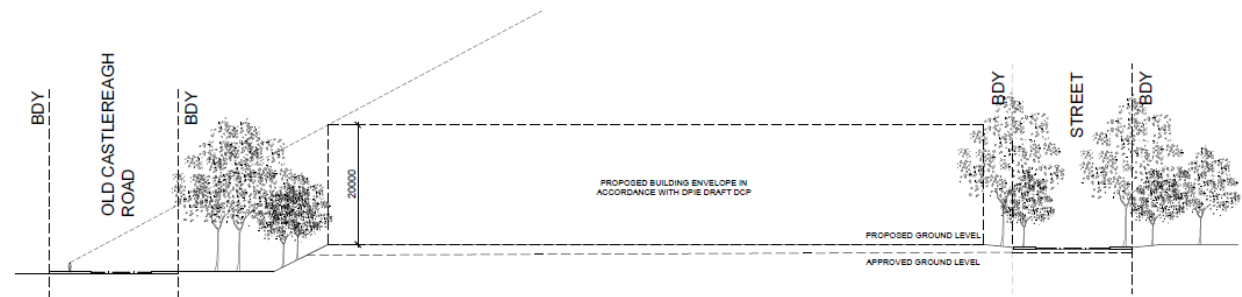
Section (Location 08) showing ground levels at Old Castlereagh Road boundary (Source: MCHP Architects)
